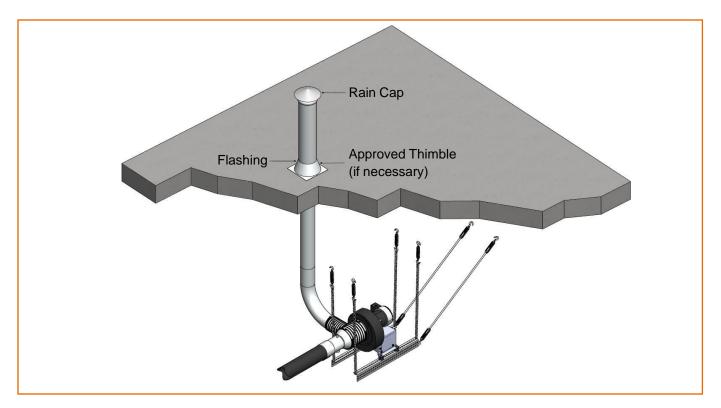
Ceiling Mounting - Recommended Venting (Vertical)
